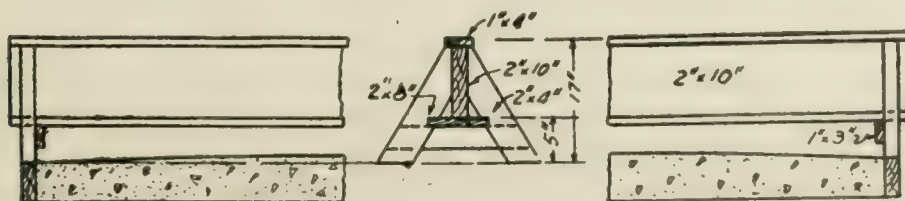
ALTERNATE BRIDGES FOR PAVEMENTS UP TO 20 FEET WIDE.
